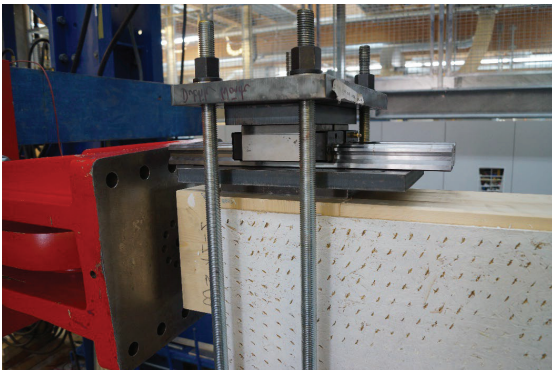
The force was applied by the red hydraulic jack. The rail construction on top of the specimen is freely movable in horizontal direction. The tensile reaction forces were transmitted through the edge studs to the top edge of the specimen, where they were then transferred to a steel plate and brought back to the specimen via four steel rods.
